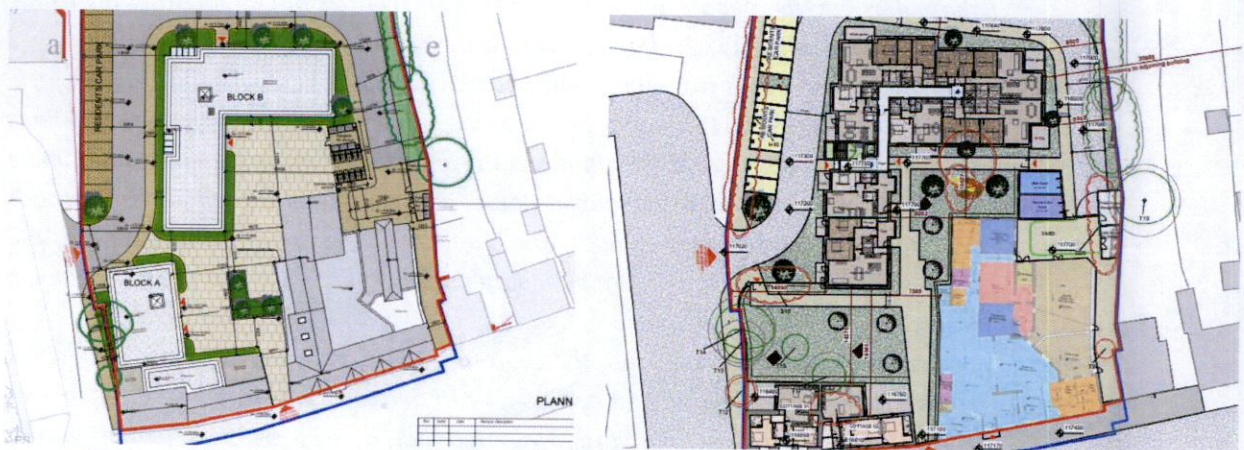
Extracts from initial site layout and proposed site layout after changes made in the AI stage.
